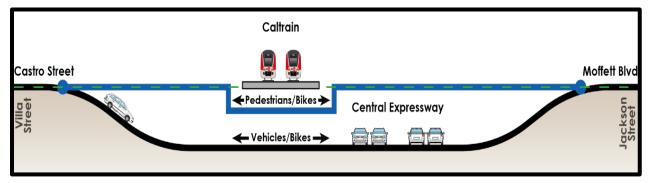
Alternative 2: Lower Castro Street/ Moffett Boulevard and Central Expressway
